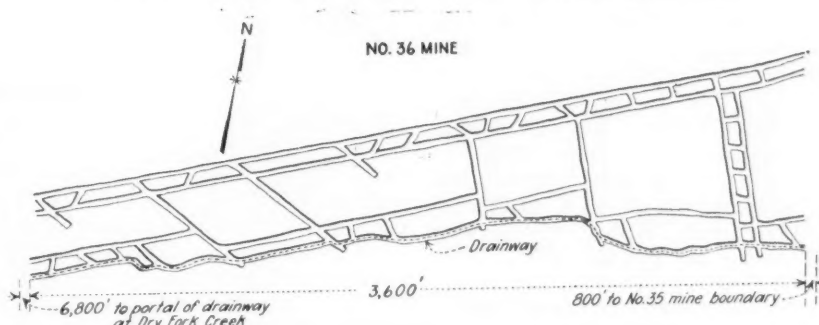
Four headings comprise the drainway entry through this section of the No. 36 mine
